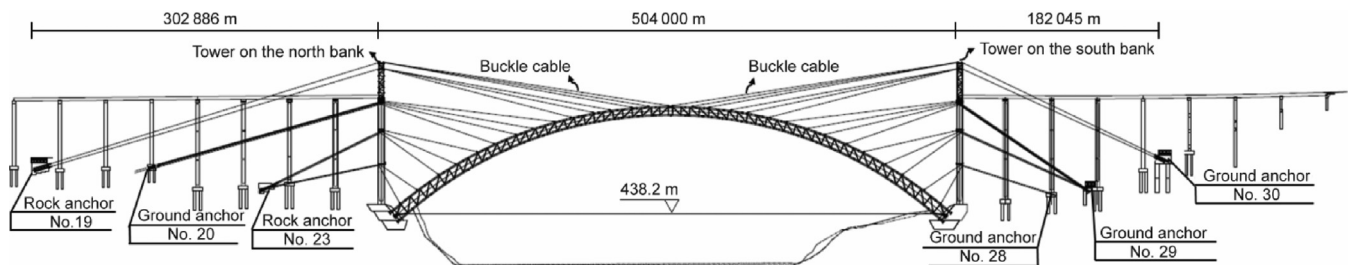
General layout of the cable-stayed system of the Deyu Expressway Wujiang Bridge.
